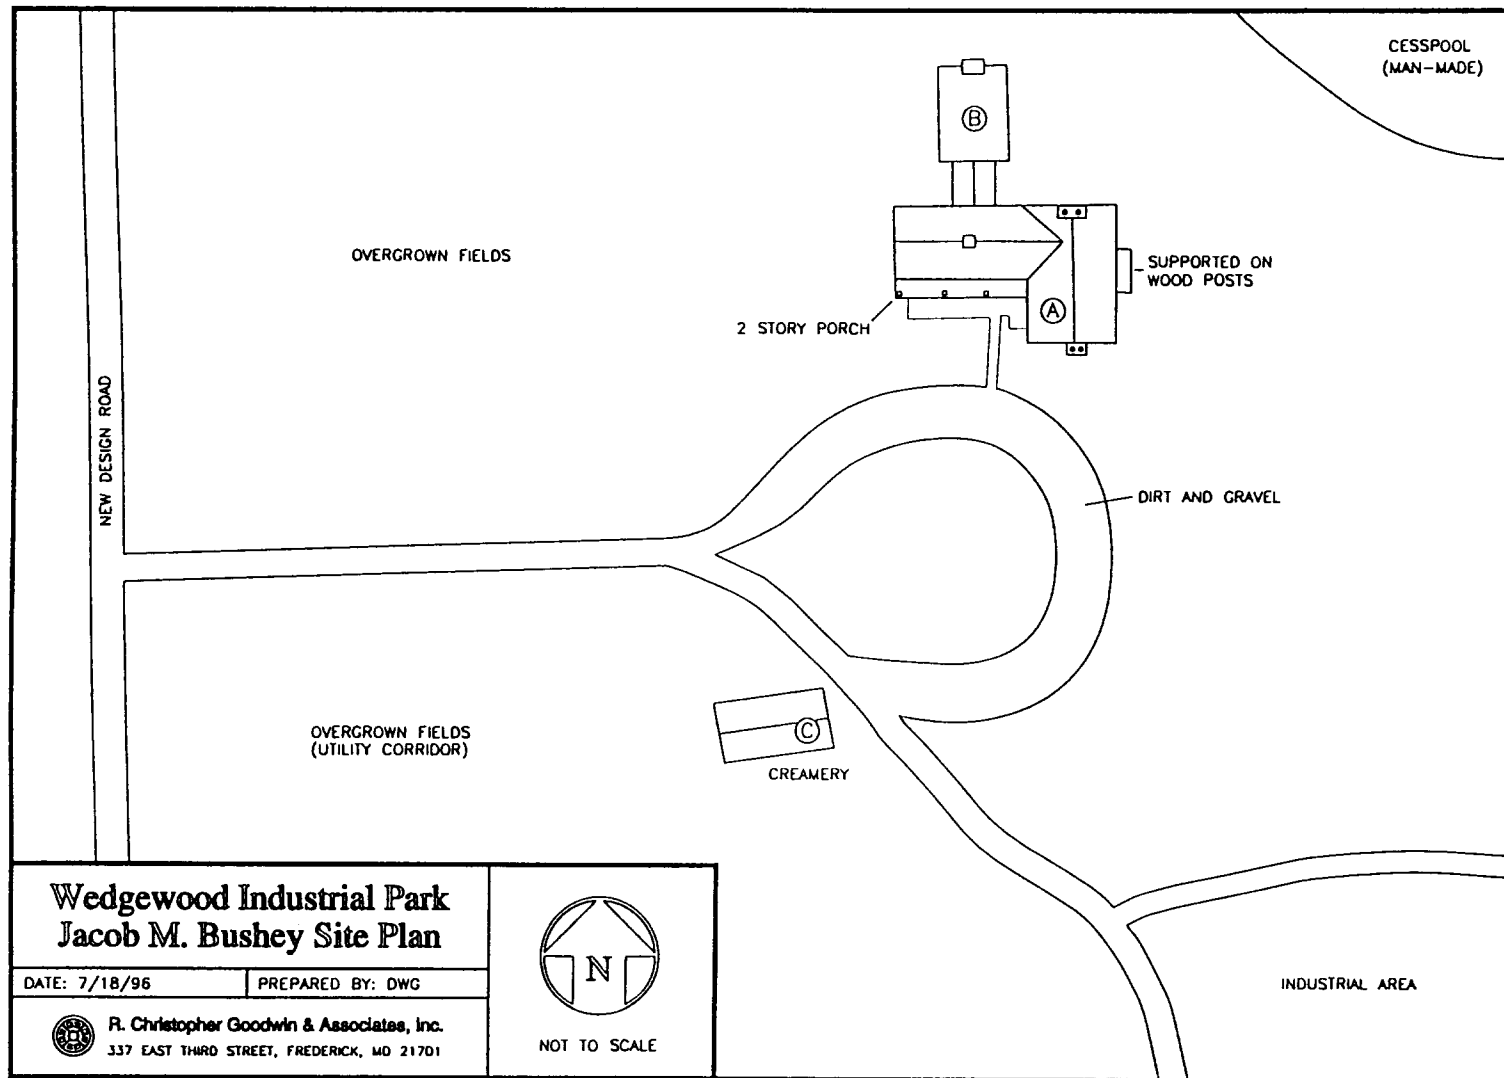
Jacob M. Bushey House (F-1-35) Site Plan
